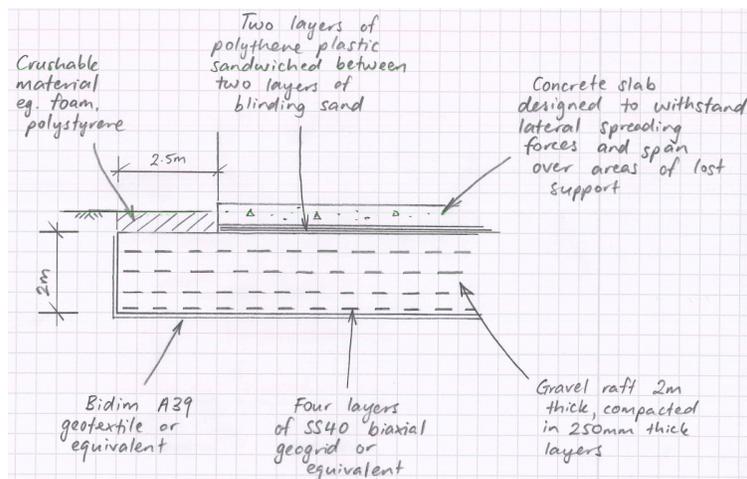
Example foundation detail to mitigate structural damage due to co-seismic horizontal ground movements.
